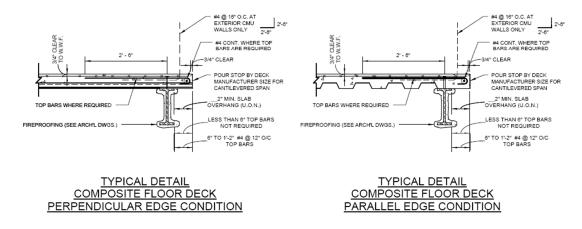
THIS FIGURE SHOWS THE TYPICAL SLAB/DECK ON FRAMING MEMBERS.
